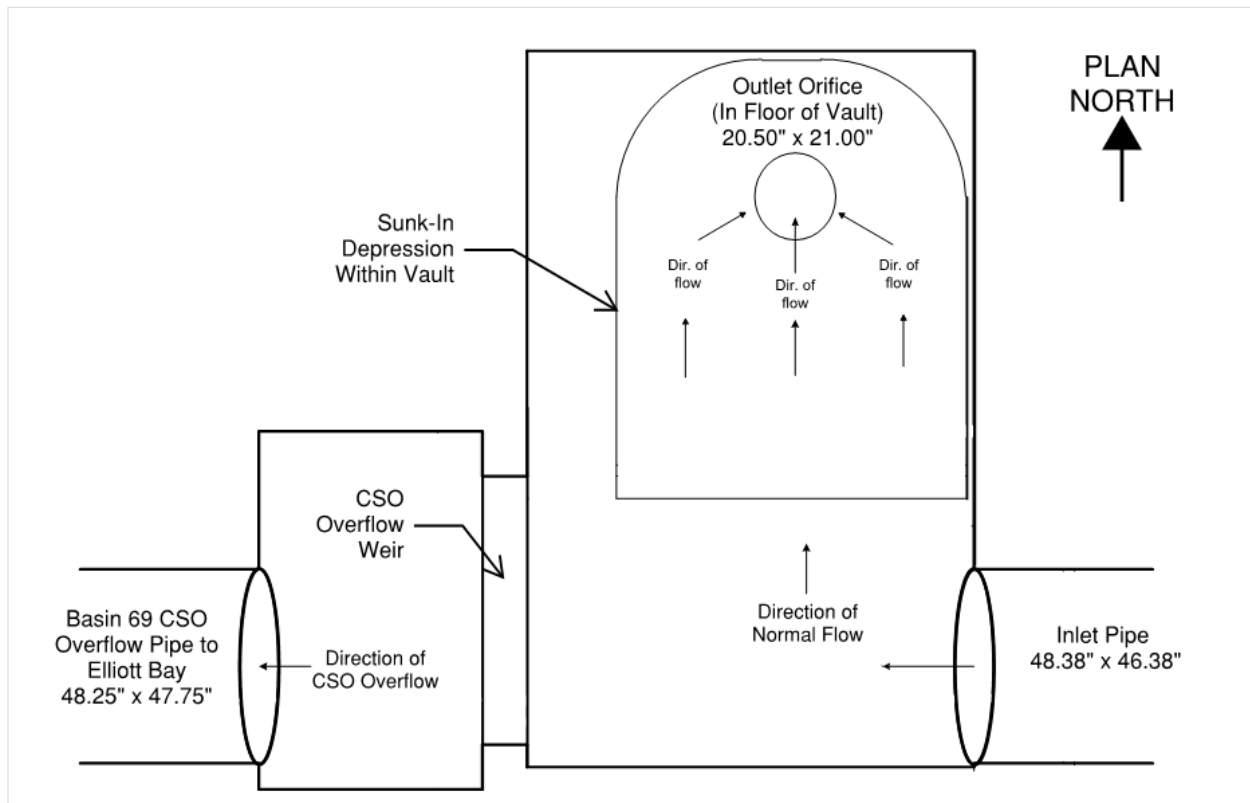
Basin 69 CSO Control Structure - Plan View
